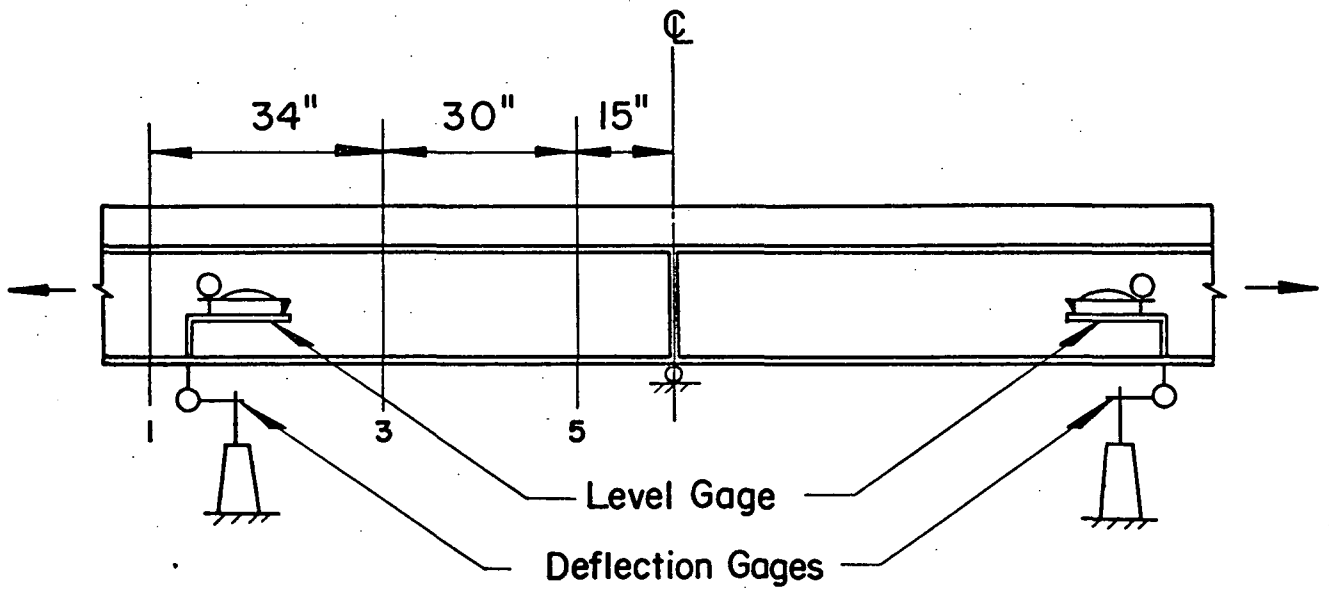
INSTRUMENTED CROSS SECTIONS FOR CC-3F & CC-4F TEST BEAMS
